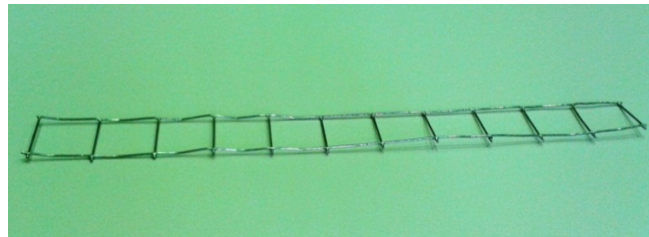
Wire mesh templates used to maintain proper spacing of the bars in the wall splice specimens reinforced with non-contact lap splices.
